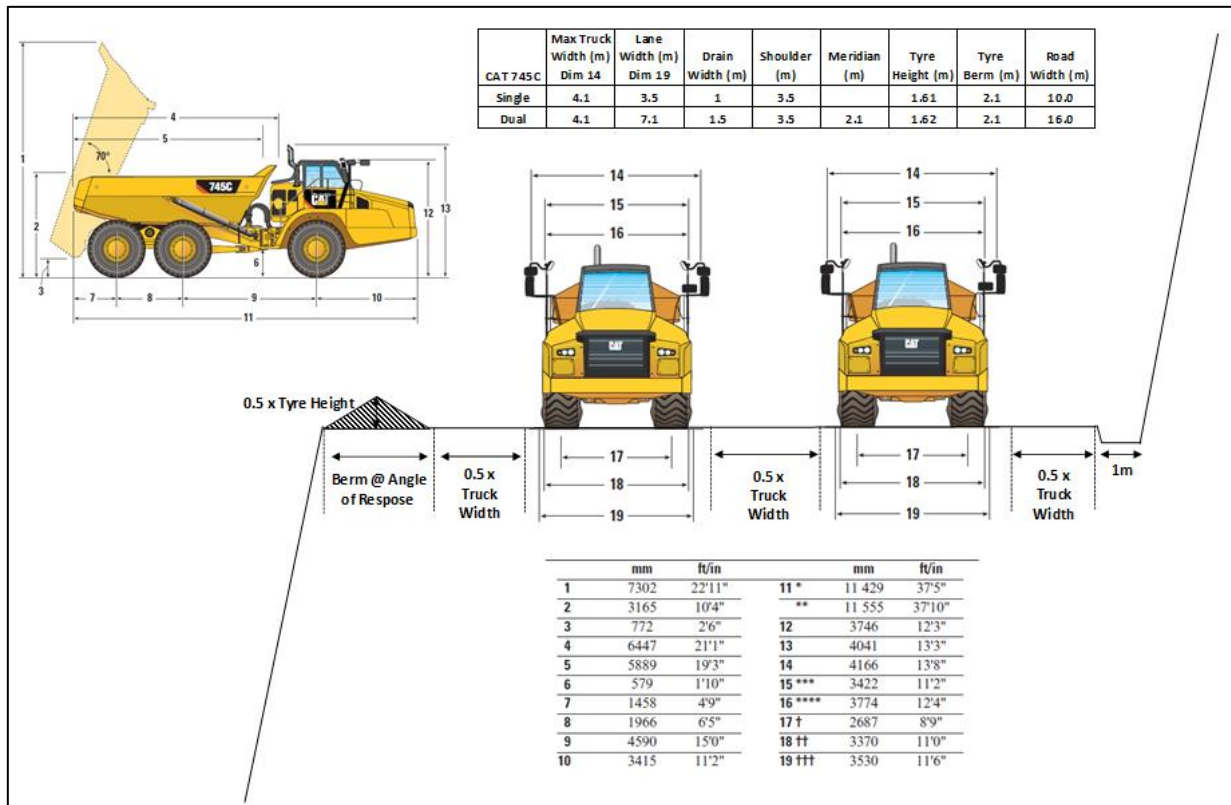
Proposed haul road dimensions for a Cat 745 (40-t) truck
